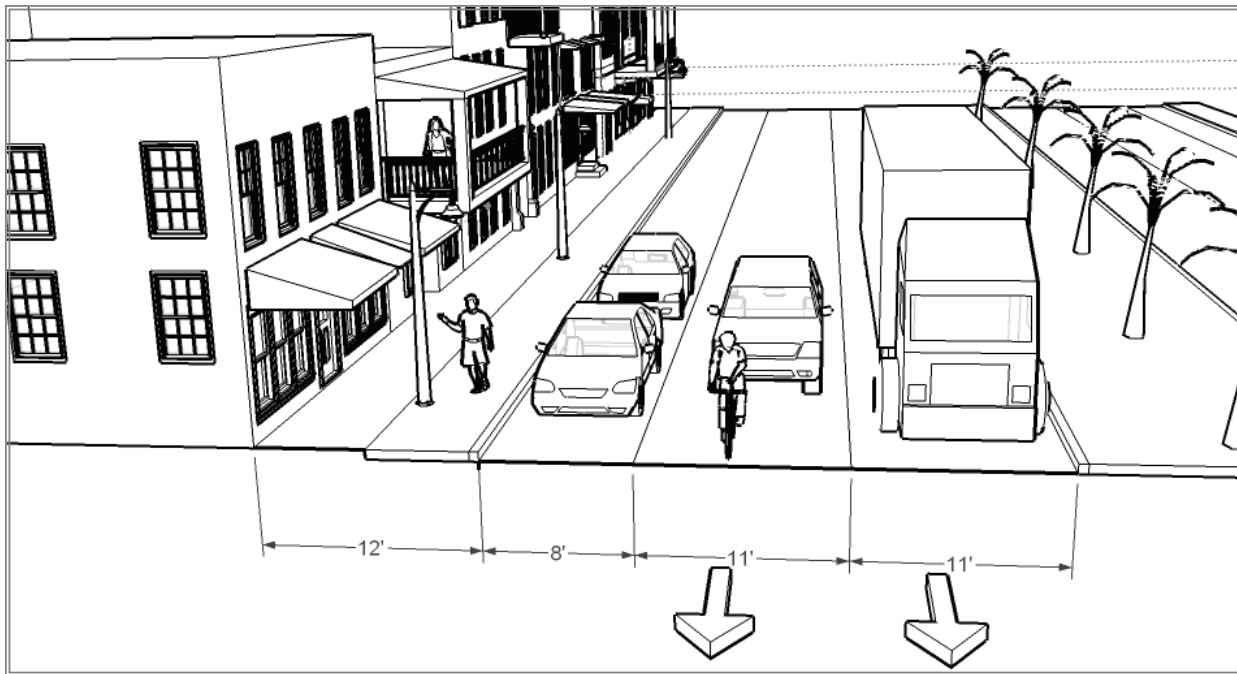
Proposed adjustment to MLK cross section at key pedestrian locations
